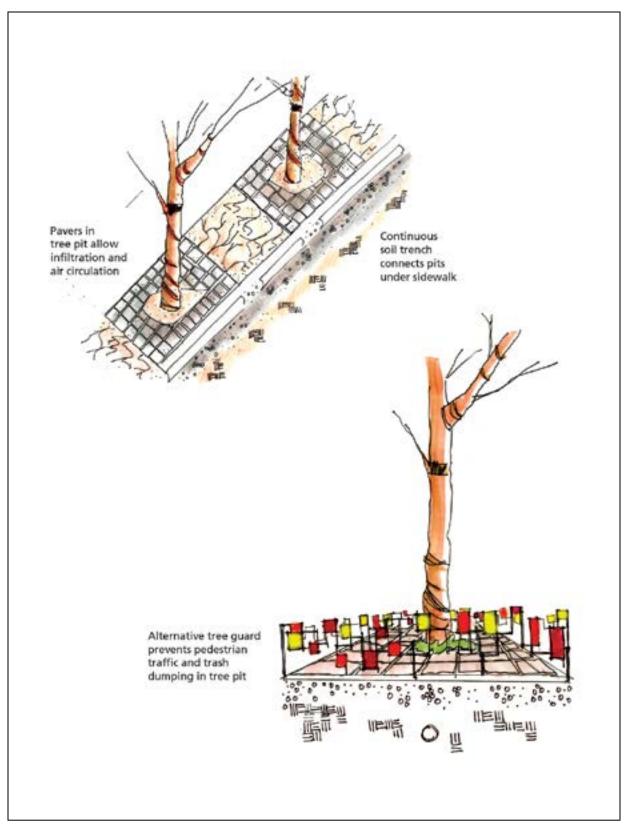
Tree pits are connected through a soil trench, and tree pit protection prevents damage from pedestrian traffic.
